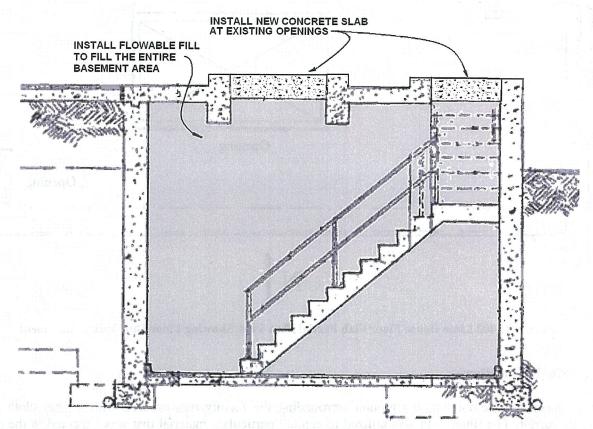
C-402 Lime House Basement Area Section View Showing Filling of Basement and Floor Openings
